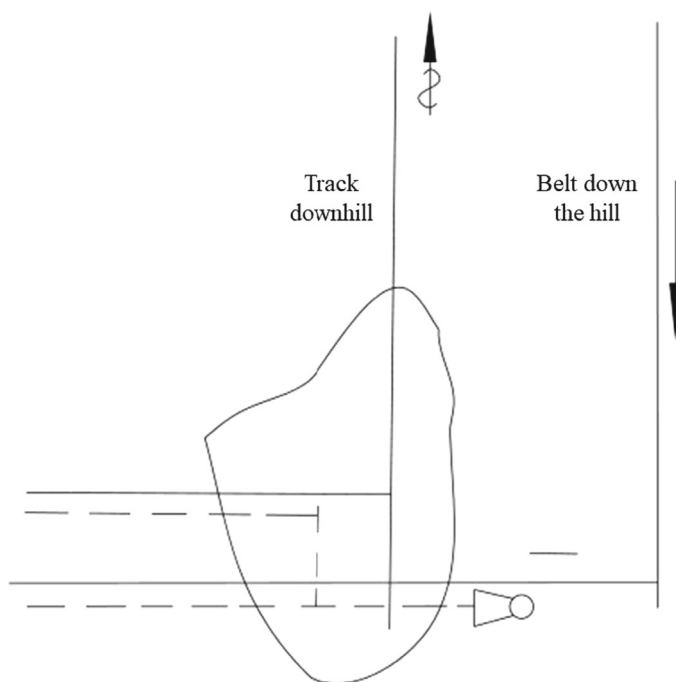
Schematic diagram of the excavation roadway mouth fire
